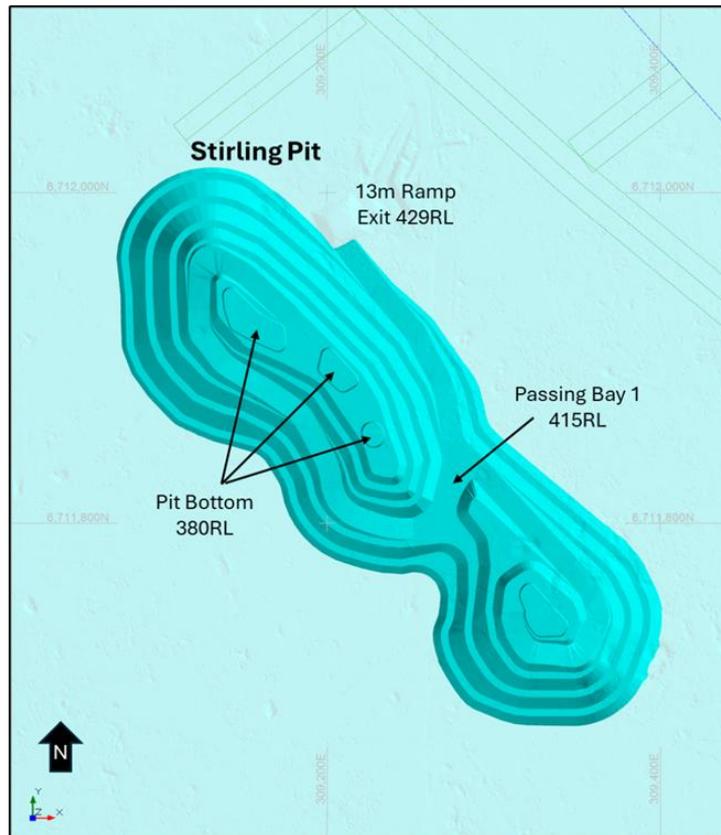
Plan view of Stirling (Lady Shenton) final pit design
